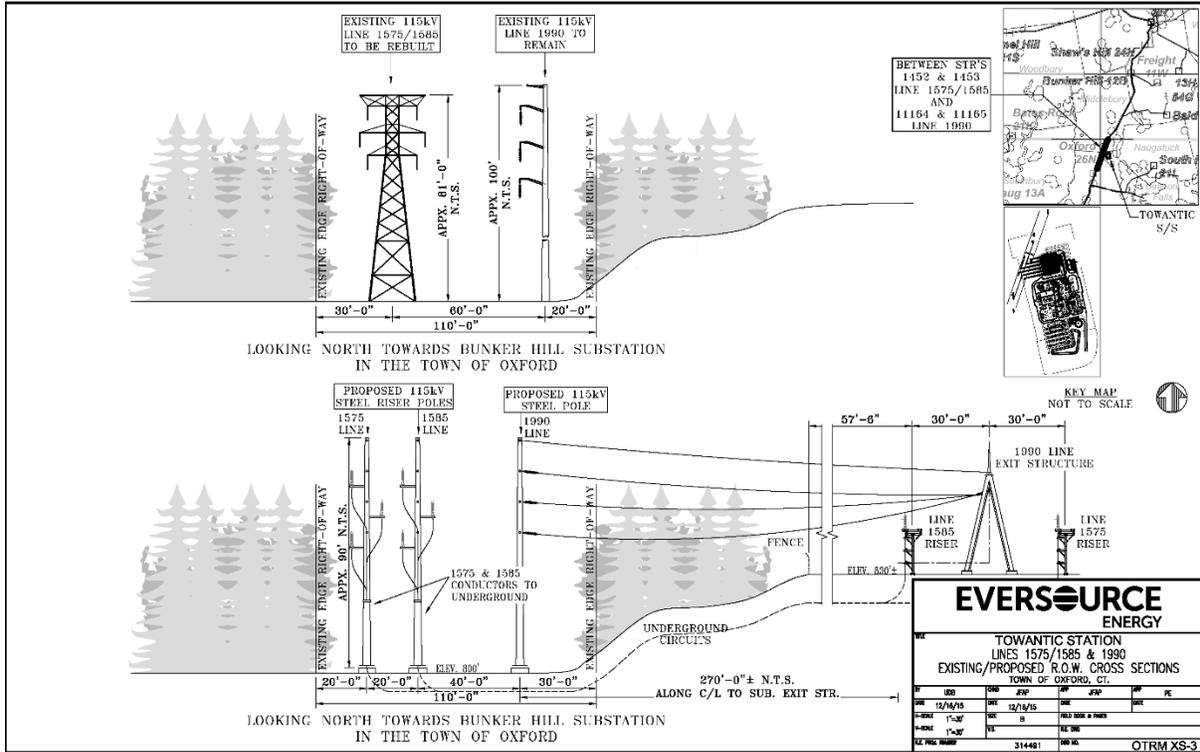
ROW at Towantic Switching Station Cross Sections – Existing & Proposed Structure Configurations: Facing North
